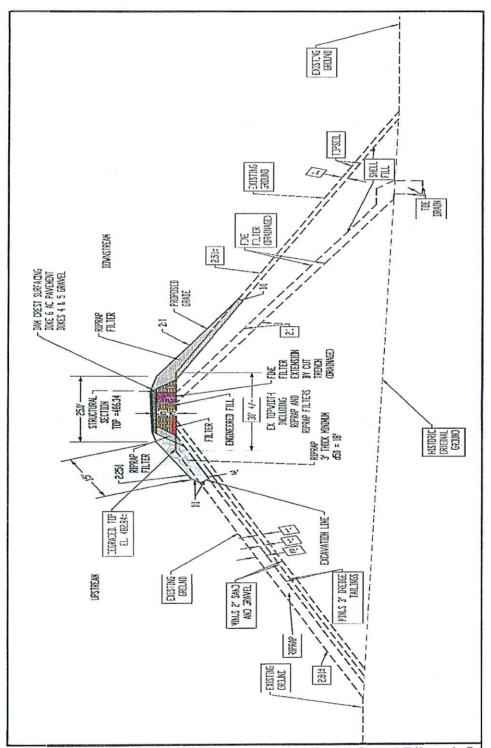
Preliminary typical cross section for 3.5-foot raise at Dikes 4, 5, and 6.
